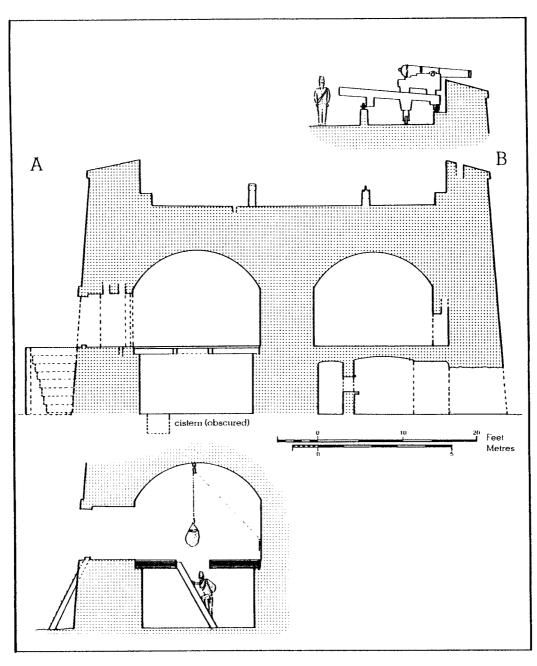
Martello Tower 'C', Lion Point, Jaywick; elevation
